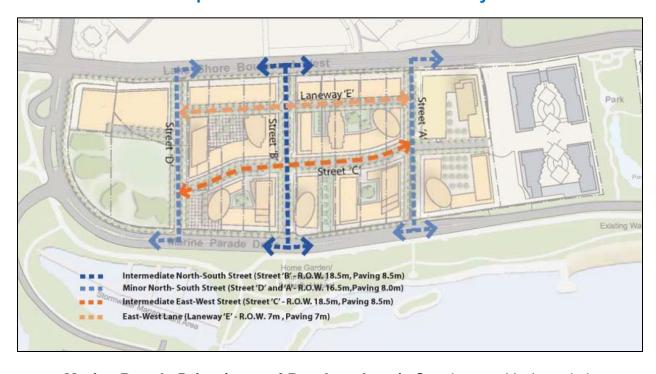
Proposed Road Network – Humber Bay Shores Area
